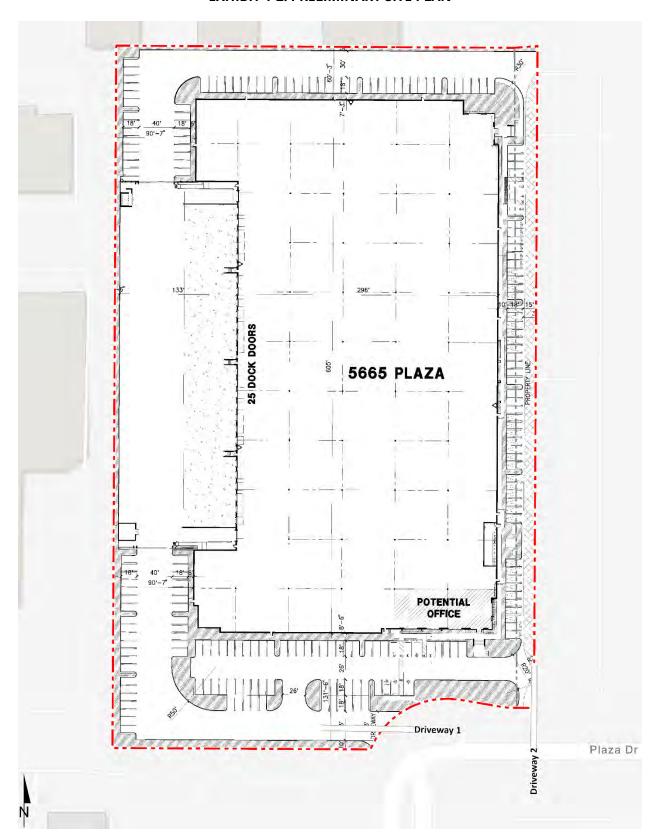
PRELIMINARY SITE PLAN
